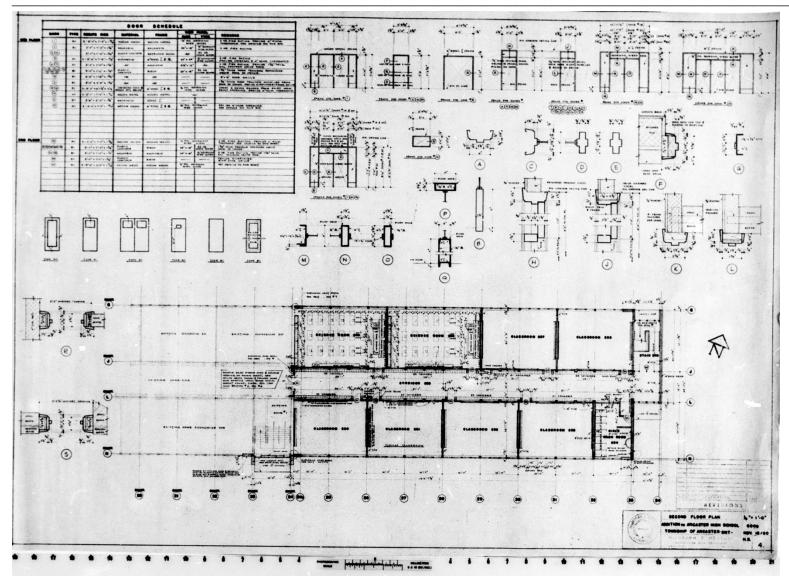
Ancaster High – McIntosh & Moeller Second Floor Plan "New Addition" 1960 (Slide 41-39: Provided by Hamilton Wentworth District School Board Archives)
